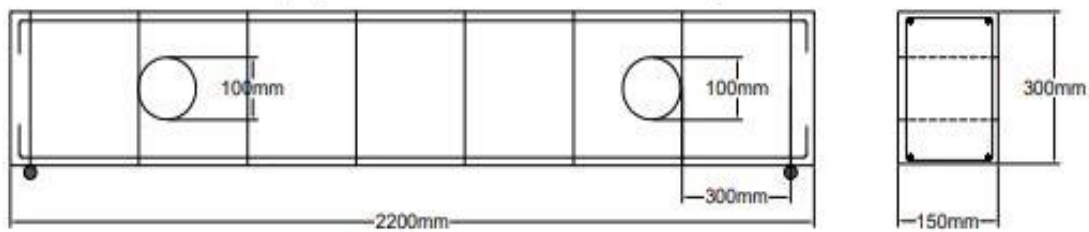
(d). Illustration of test beams (B2 and B10) with two openings and 100mm diameter PVC pipes placed transversely at both shear zones
